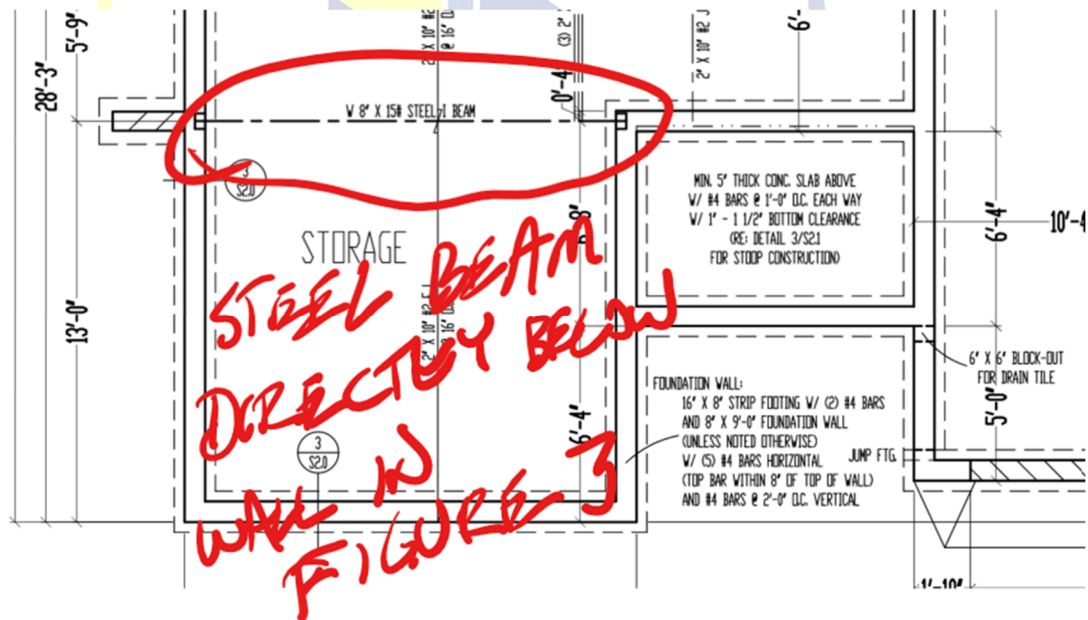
Partial foundation plan showing steel beam directly below wall used for bearing
